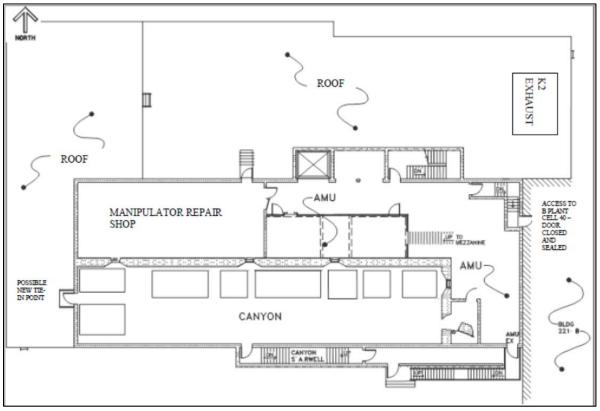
Waste Encapsulation and Storage Facility 225-B Building Second Floor Plan
